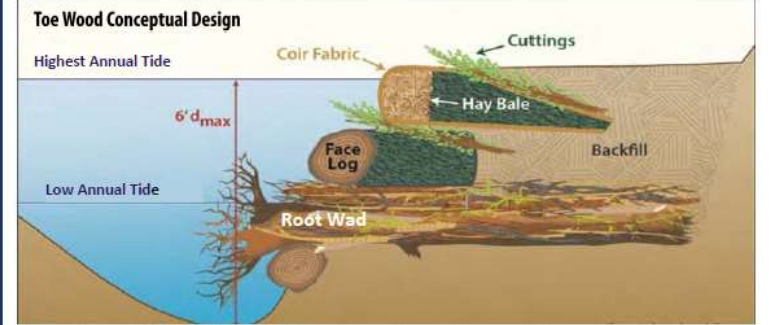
Root wads inserted into unstable banks can help protect bare soil from erosion. In areas not suitable for living shorelines, root wads can be an effective alternative. Image adapted from: Bayou Preservation Association, <http://www.preservingbayou.org/about-us/>.
